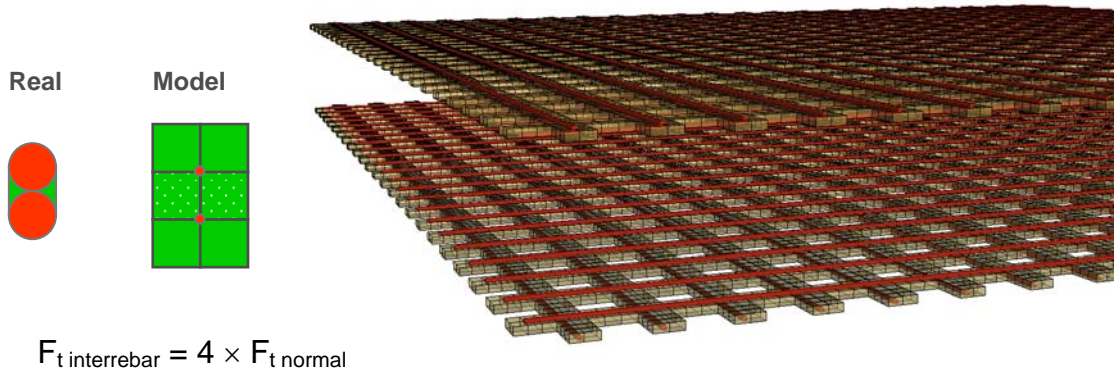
Adjustment of tensile strength for brick elements around rebars to limit build up of crack energy.
